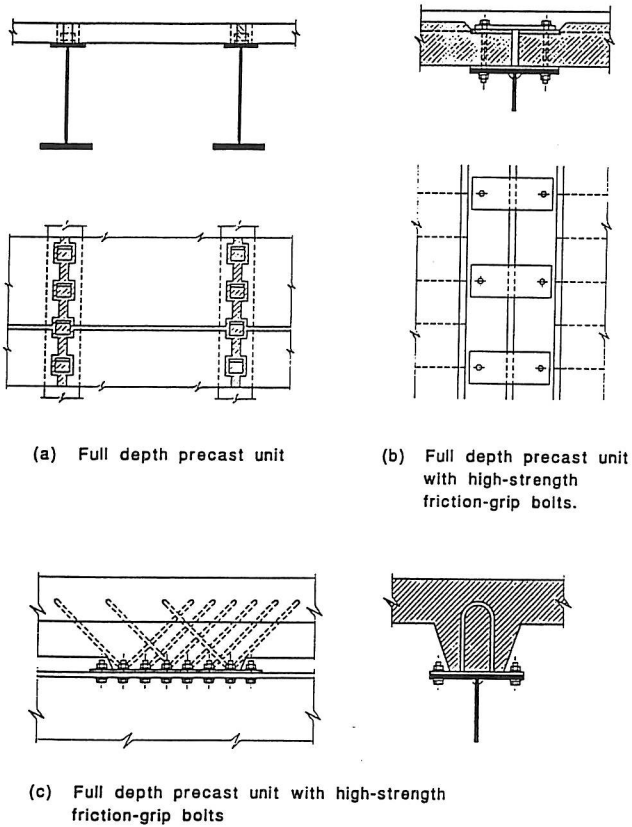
Means of eliminating conventional formwork for reinforced concrete decks.
